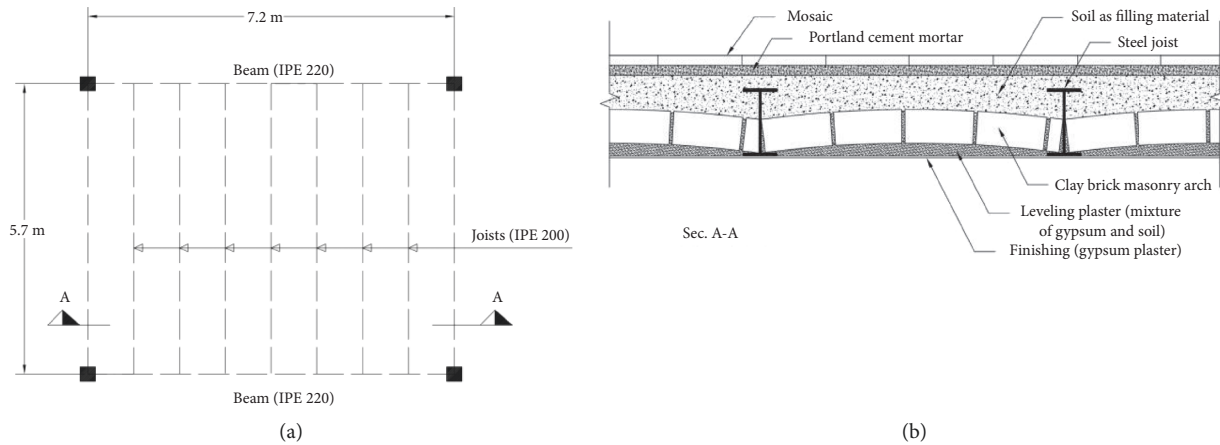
Jack arch flooring system (plan view and the cross section A-A).
